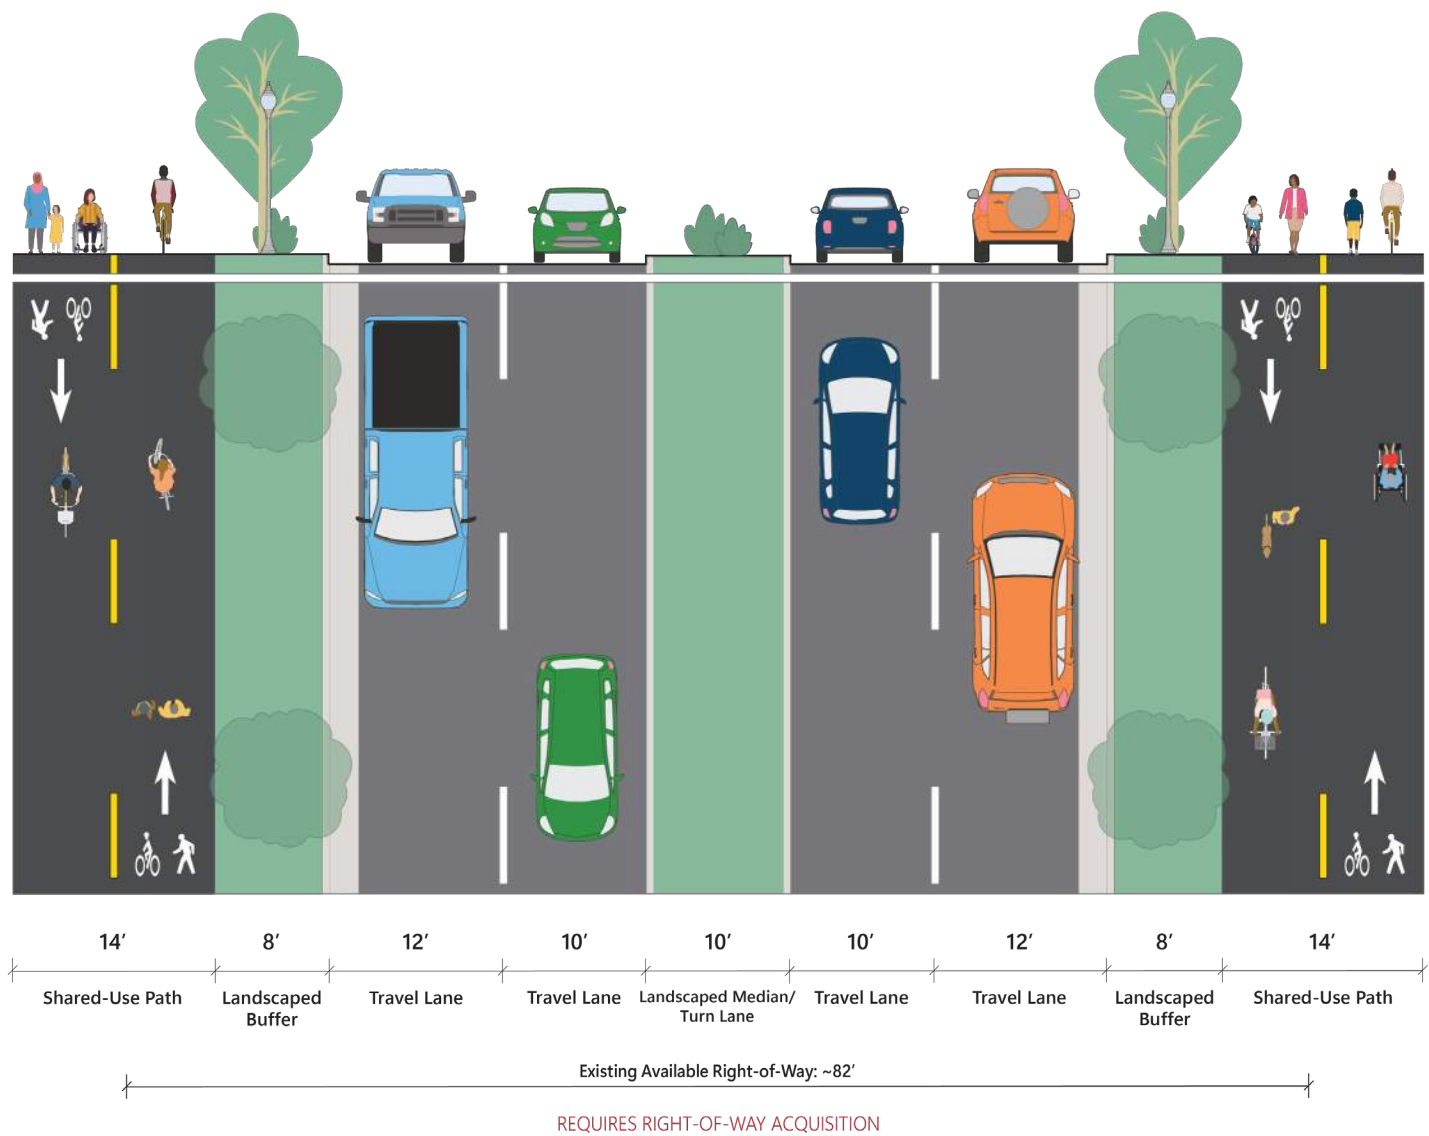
Pecos Street Option B typical cross-section (looking north)
